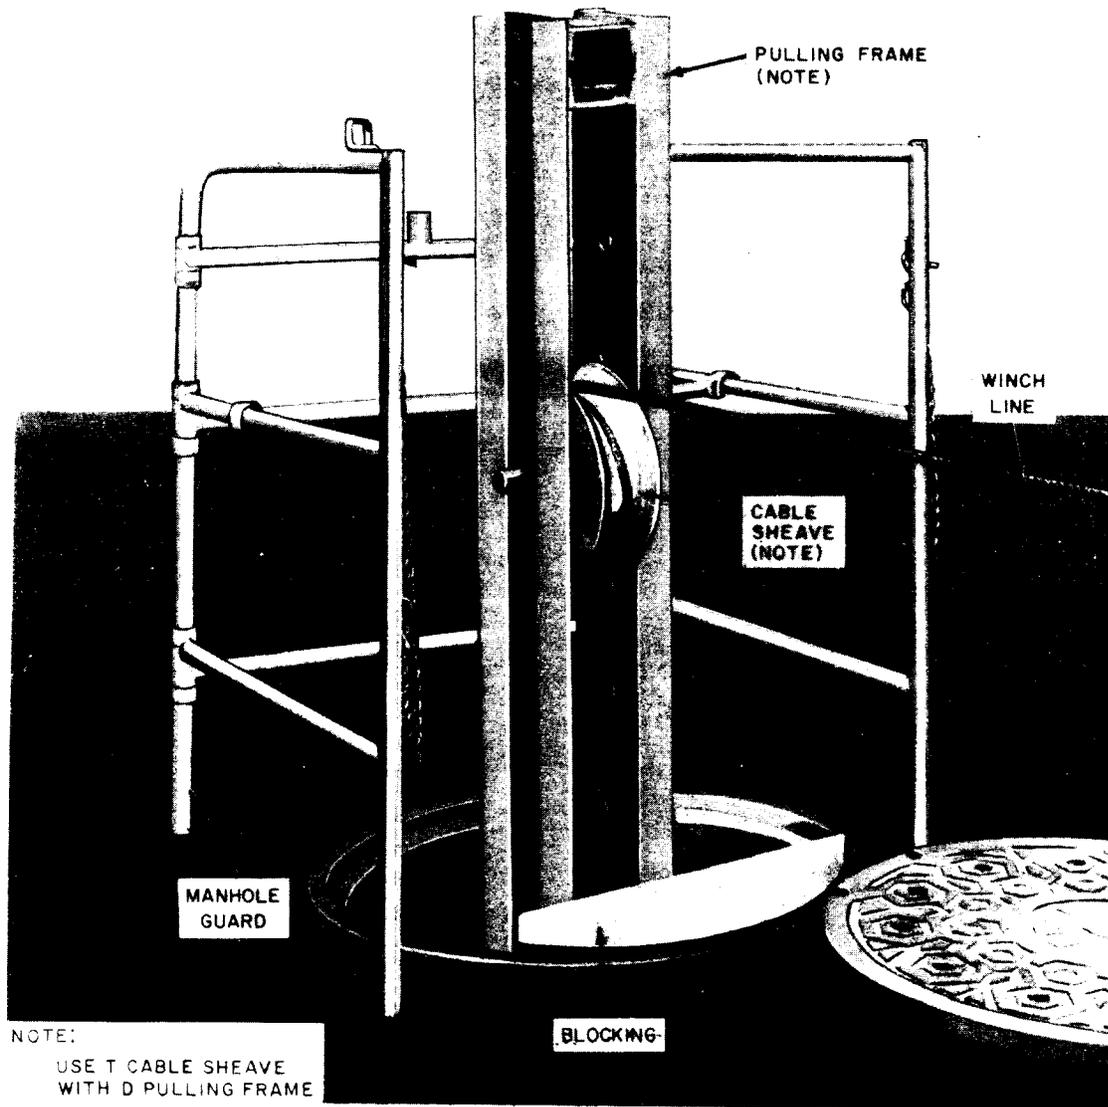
View Above Manhole Showing Pulling Frame and Cable Sheave
